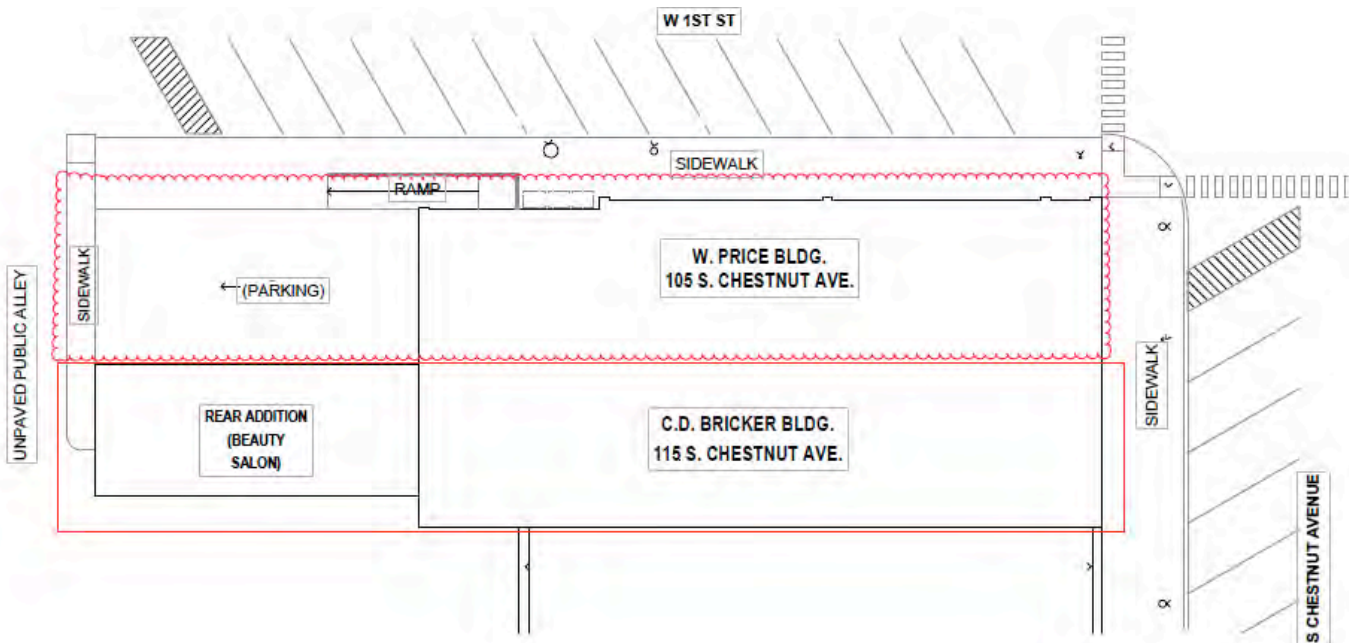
Site plan, 105-115 S. Chestnut Avenue, Earlham. (Shiffler Associates Architects, 2016)
